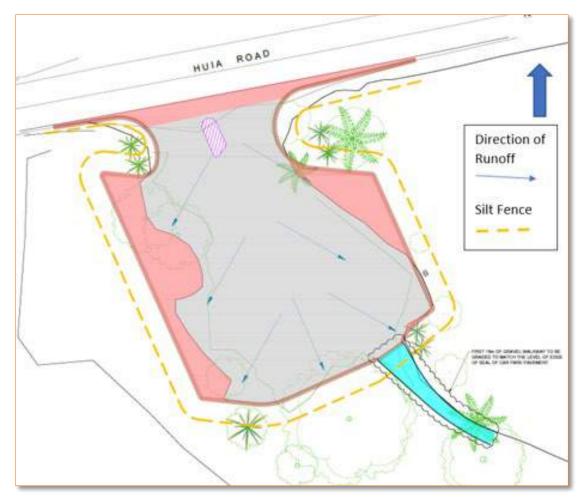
Silt fence protection and stormwater management. (Source: Stantec Design Drawing Set)
